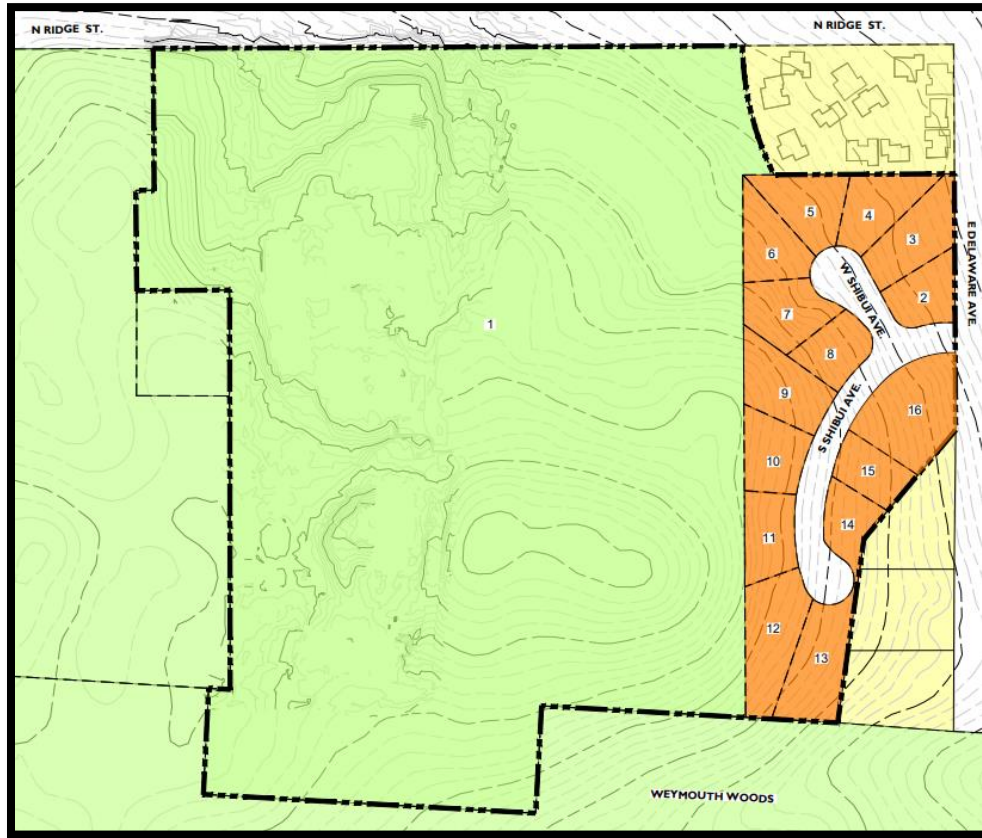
Applicant's Conceptual Master Plan (See Exhibit IV)
